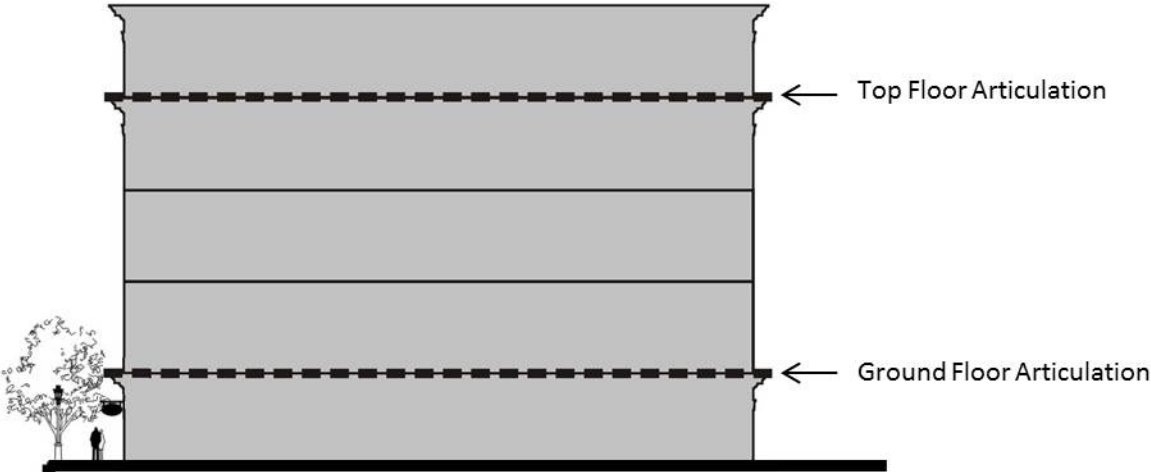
A.2: BUILDING HEIGHT ARTICULATION
